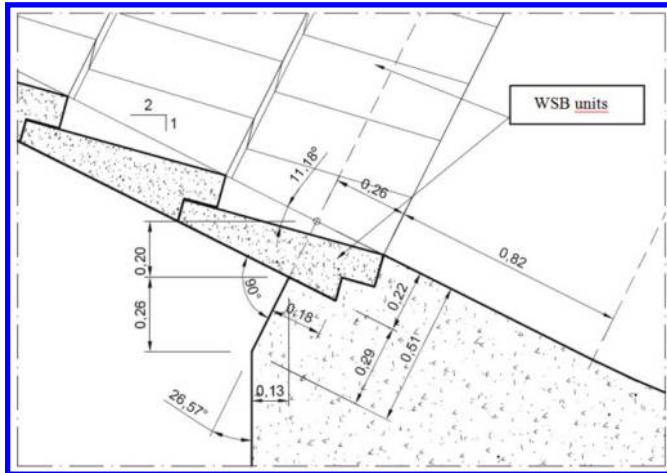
Downstream joint. Cross section of the first row of WSB next to the flip bucket.
